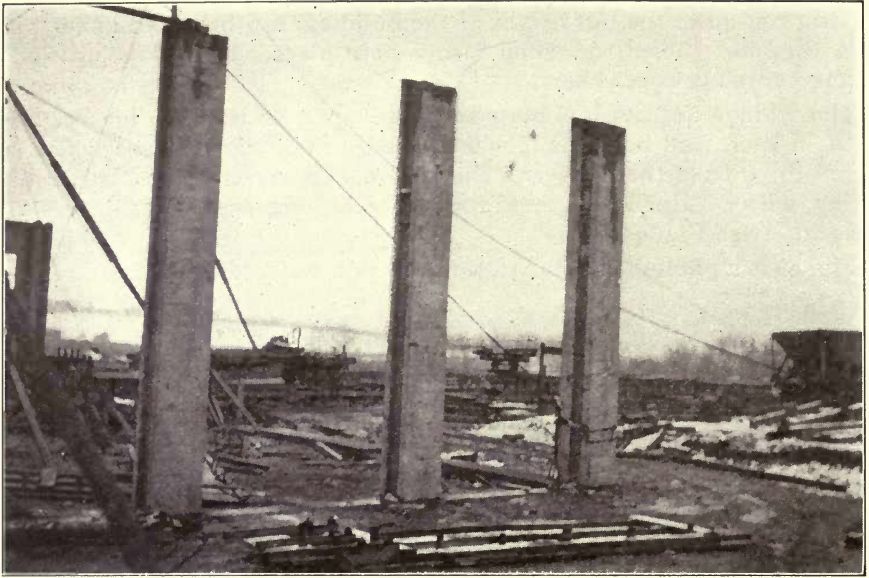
Wall Piers for an Atlas Portland Cement Company Building. (*See p. 173.*)
